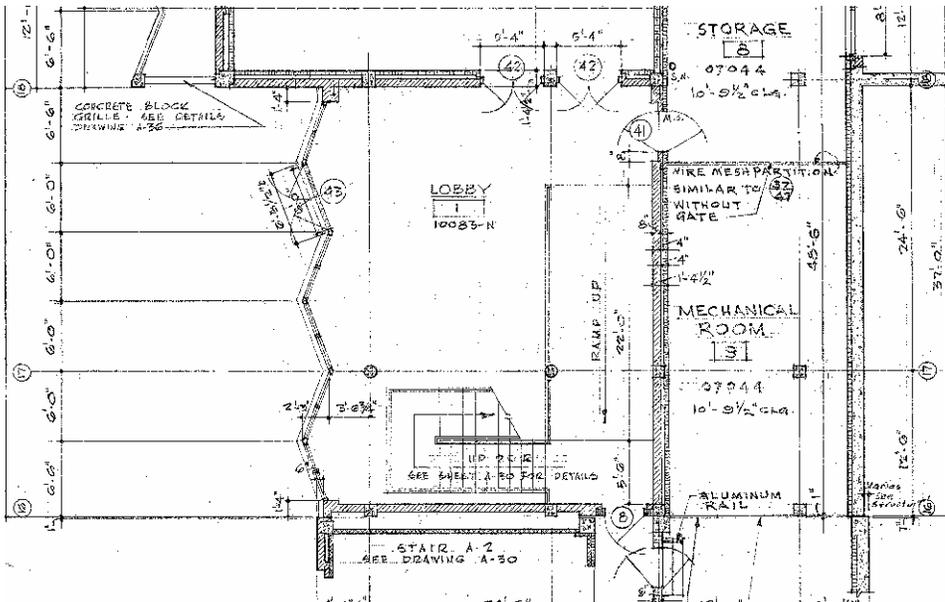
Original Construction Document, Basement Lobby Space [9]
